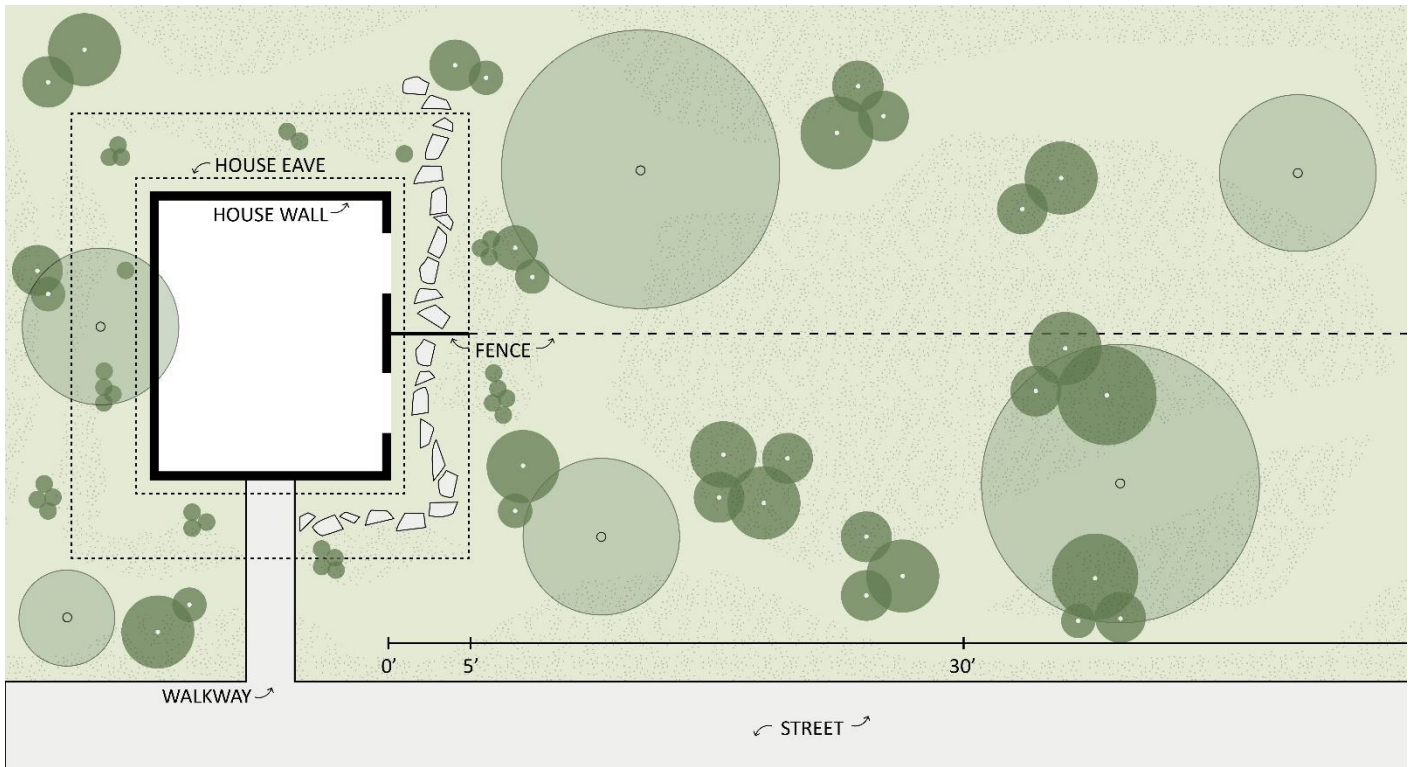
This illustrated aerial view demonstrates how trees (larger light green circles), smaller trees and shrubs (darker circles), plants, pavers, and a fence might be arranged under the April 2026 draft. Note that trees can be near homes if their branches are appropriately separated from the roof or chimney. Other details include an upgrade to the fence attachment, and some plants are present in Zone 0, but they are separated from vulnerable areas such as the base of the wall, under eaves, and near windows.
